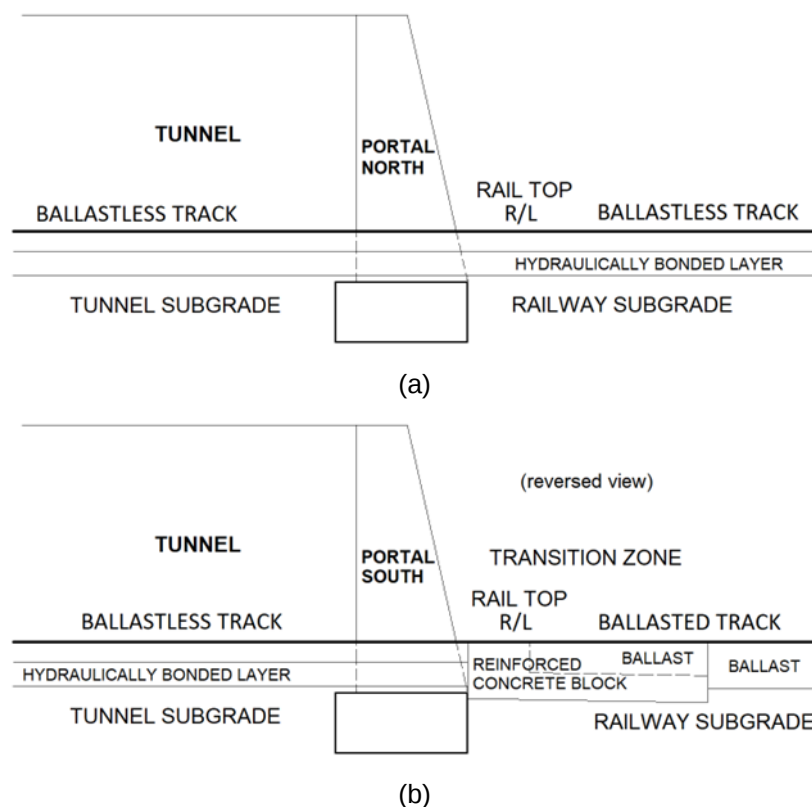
Structural parts and layers in tunnel transition zones: (a) Continuous ballastless track; (b) Ballastless track in the tunnel and ballasted track out of the tunnel.
